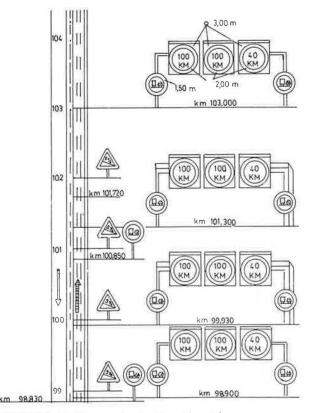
Traffic sign plan for Elzer Mountain, downgrade direction.
